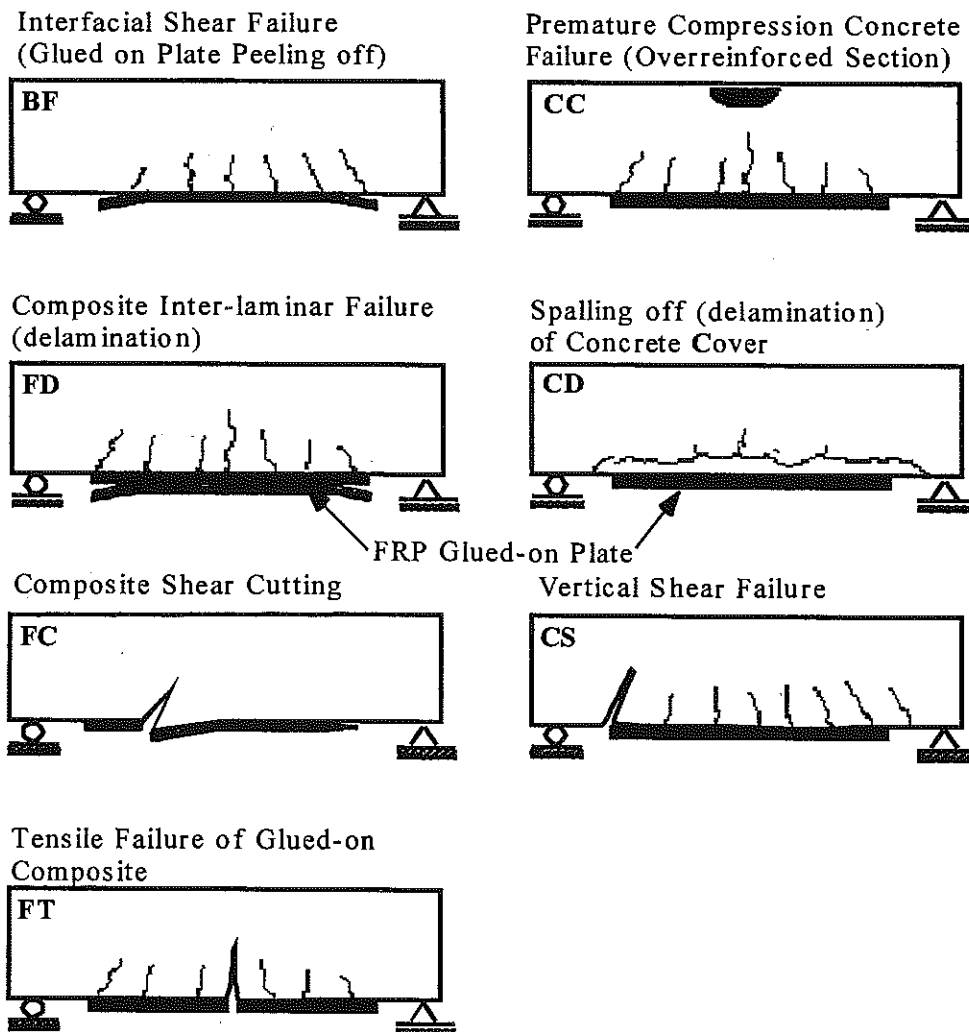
Typical Failure Modes of RC and PC Beams Strengthened with FRP
